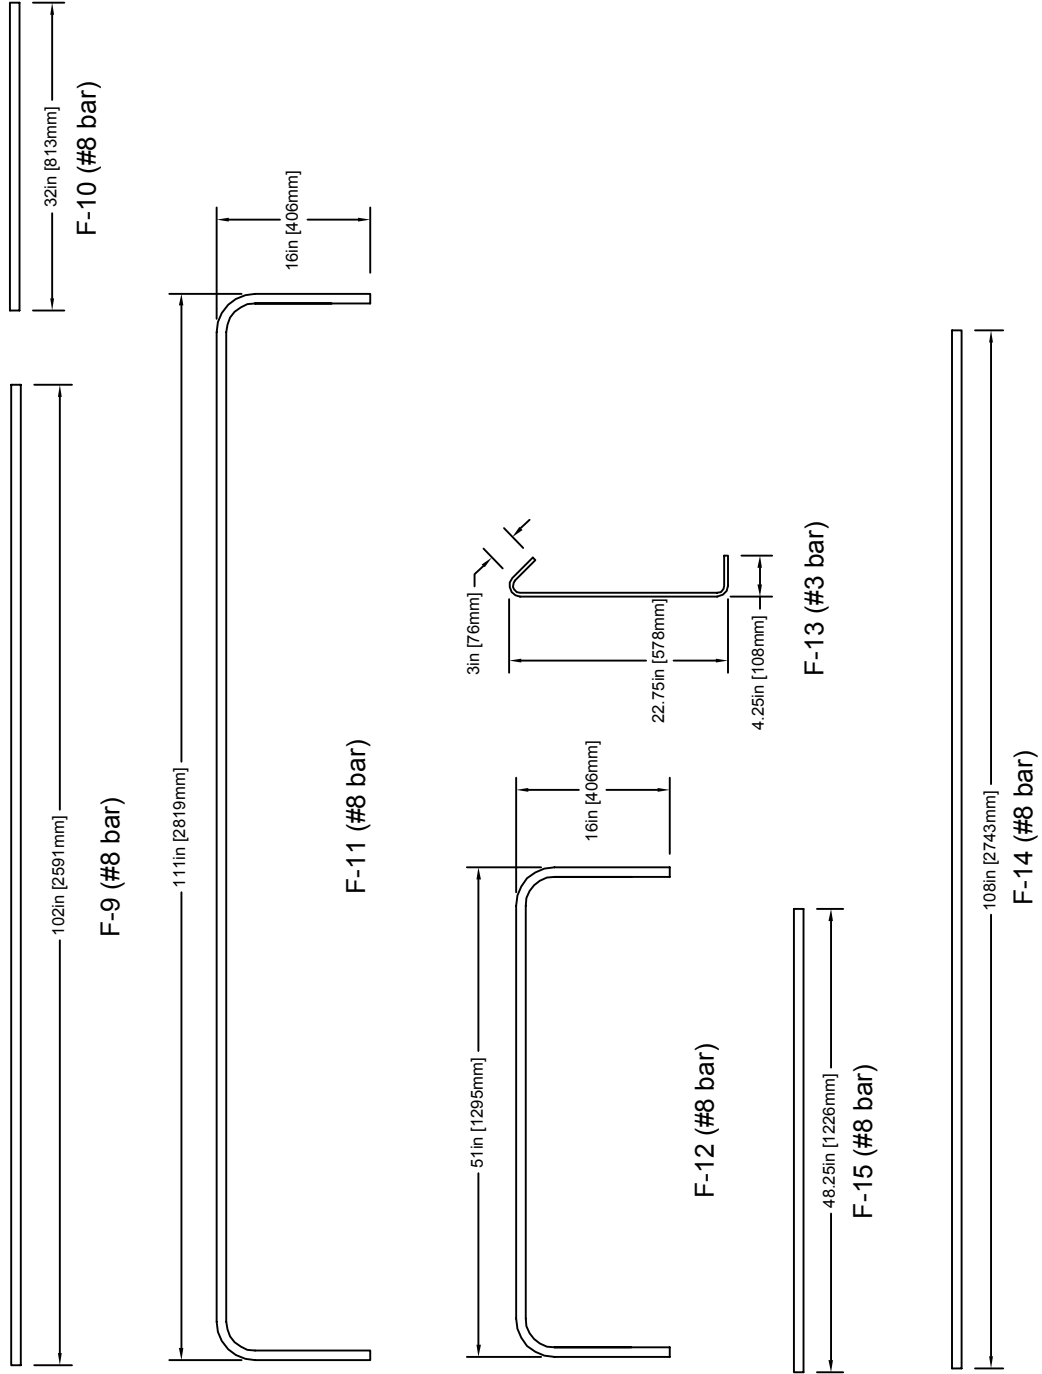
Bridge Plans Sheet 24; Steel Details 6.
